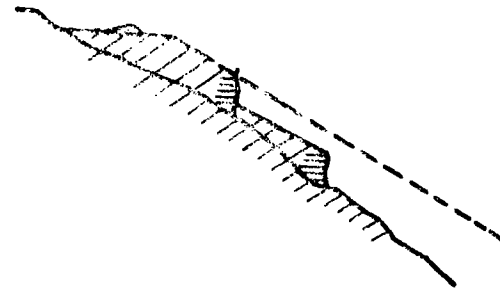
DOUBLE RETAINING WALLS OF REINFORCED EARTH FOR HIGHWAY
